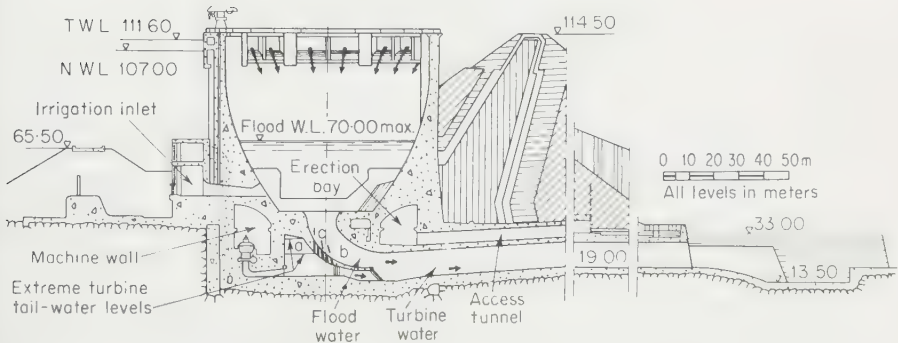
Cross section through the circular power station showing the arrangement for handling flood discharges.
